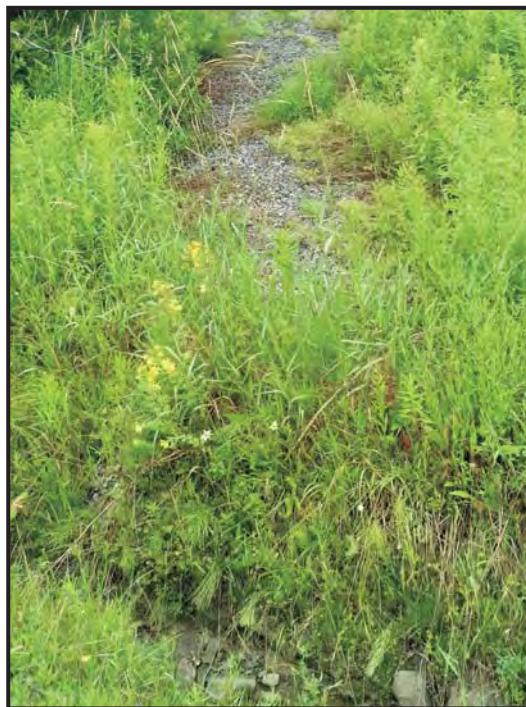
Gravel drainage area at east end of north permeable reactive wall.
